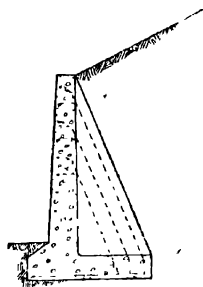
Reinforced Concrete Wall (L-shaped).
